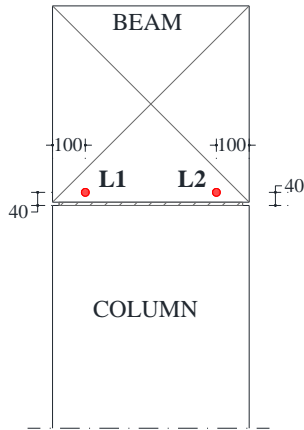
Geometrical layout of the LVDTs at the beam end in the test 2 (dimensions are expressed in mm)
